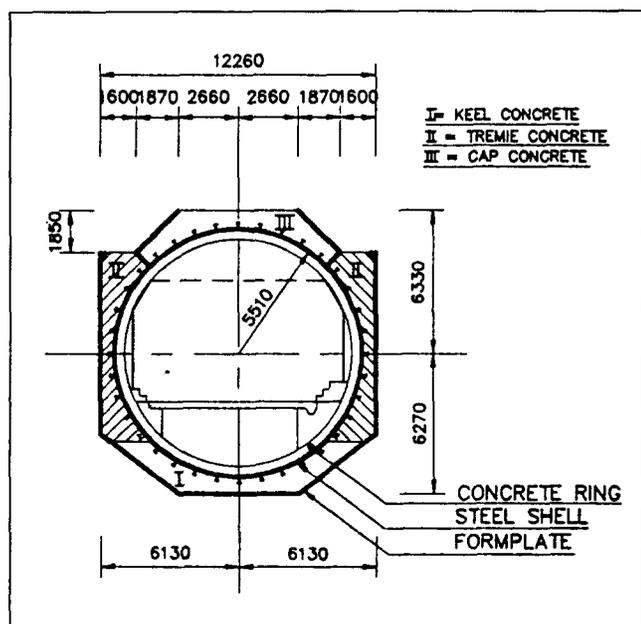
Typical cross-section of a double-steel-shell tunnel.
